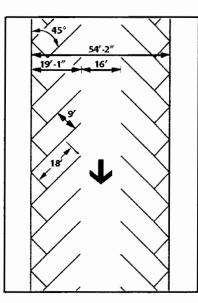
Minimum Dimensions for Common Parking Lot Layouts
